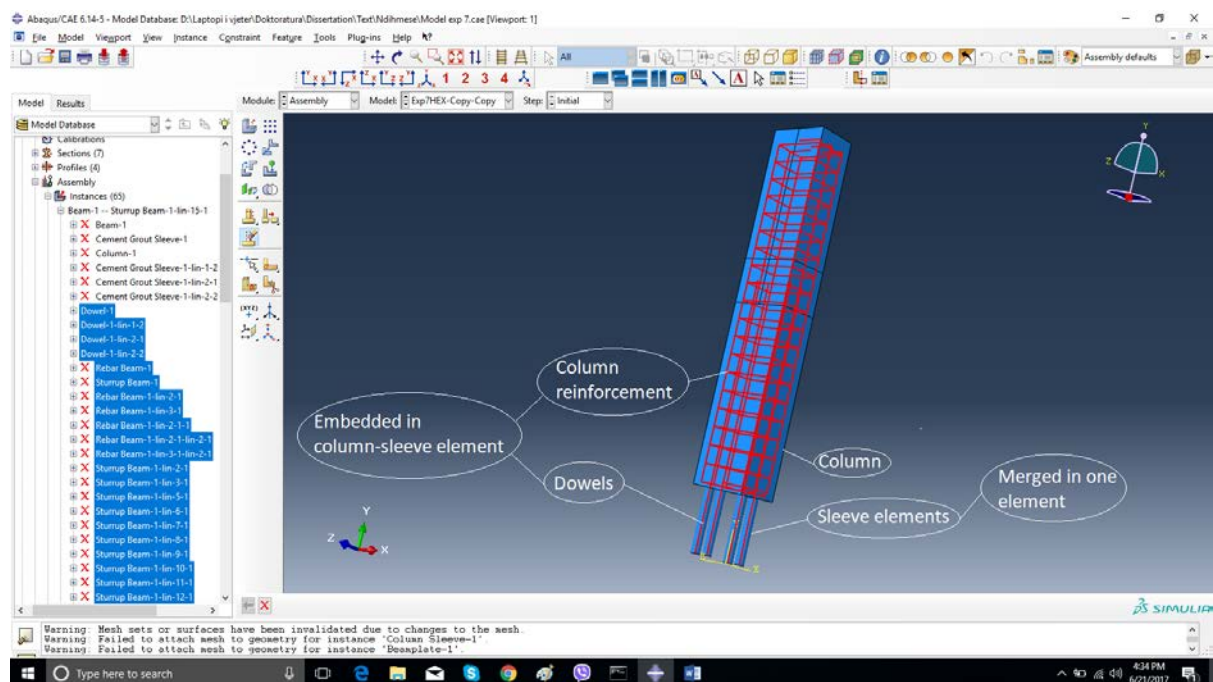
Graphic presentation of assembling column, sleeve elements, column reinforcement and dowels.
